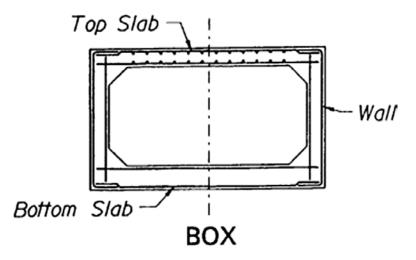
Typical PCBC with Reinforcement and Haunches at Corners
